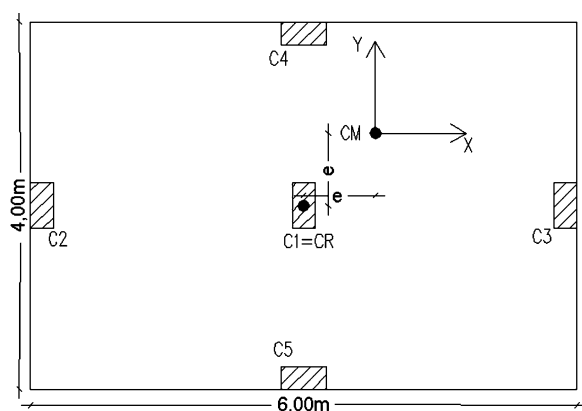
Plan of single-story R/C asymmetric buildings
